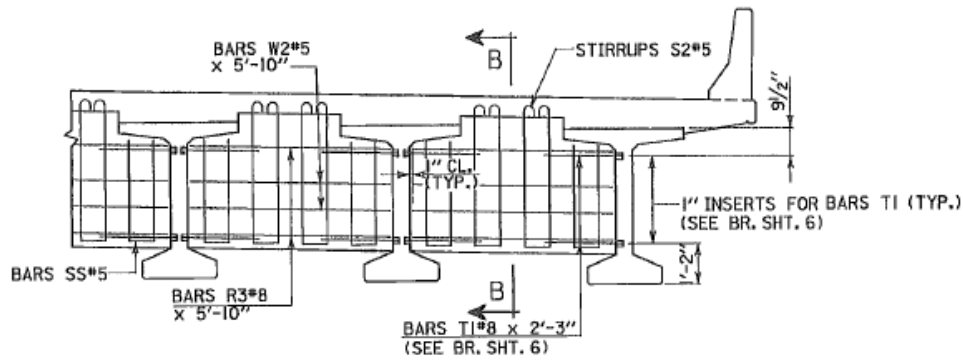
Cross section view of midspan and quarterspan webwalls.
